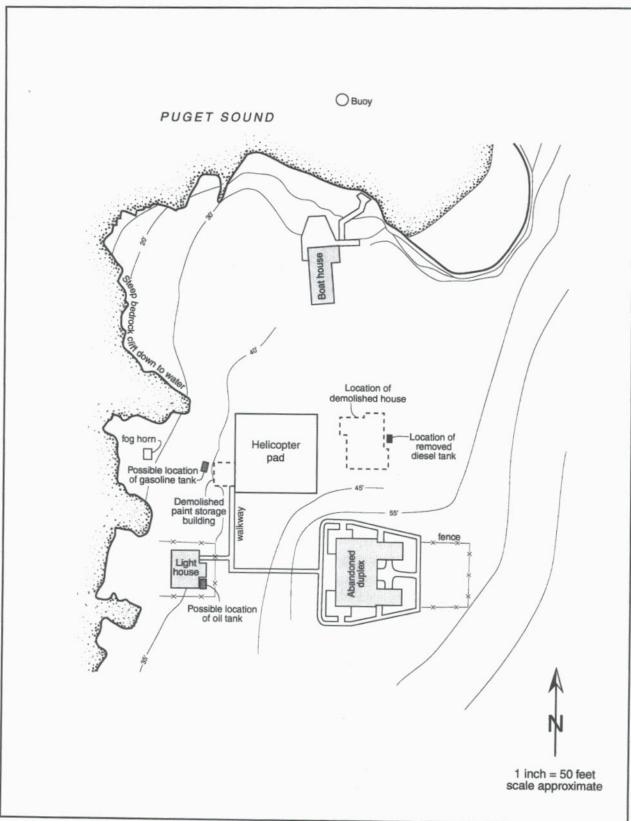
Plan map of project area (drafted from U.S. Coast Guard Engineering Plans).
